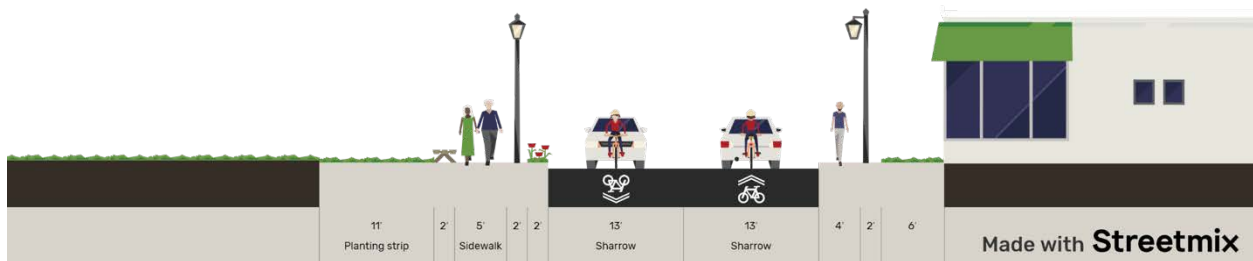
Proposed layout for Winburn Street, looking east toward Carroll Street. The new design includes ADA-compliant sidewalks on each side of the street, pedestrian-scale lighting on both sides, and bike sharrows on the street. A sidewalk buffer and seating options will also be provided on the park side. Diagram created in Streetmix by EC, 2022.
